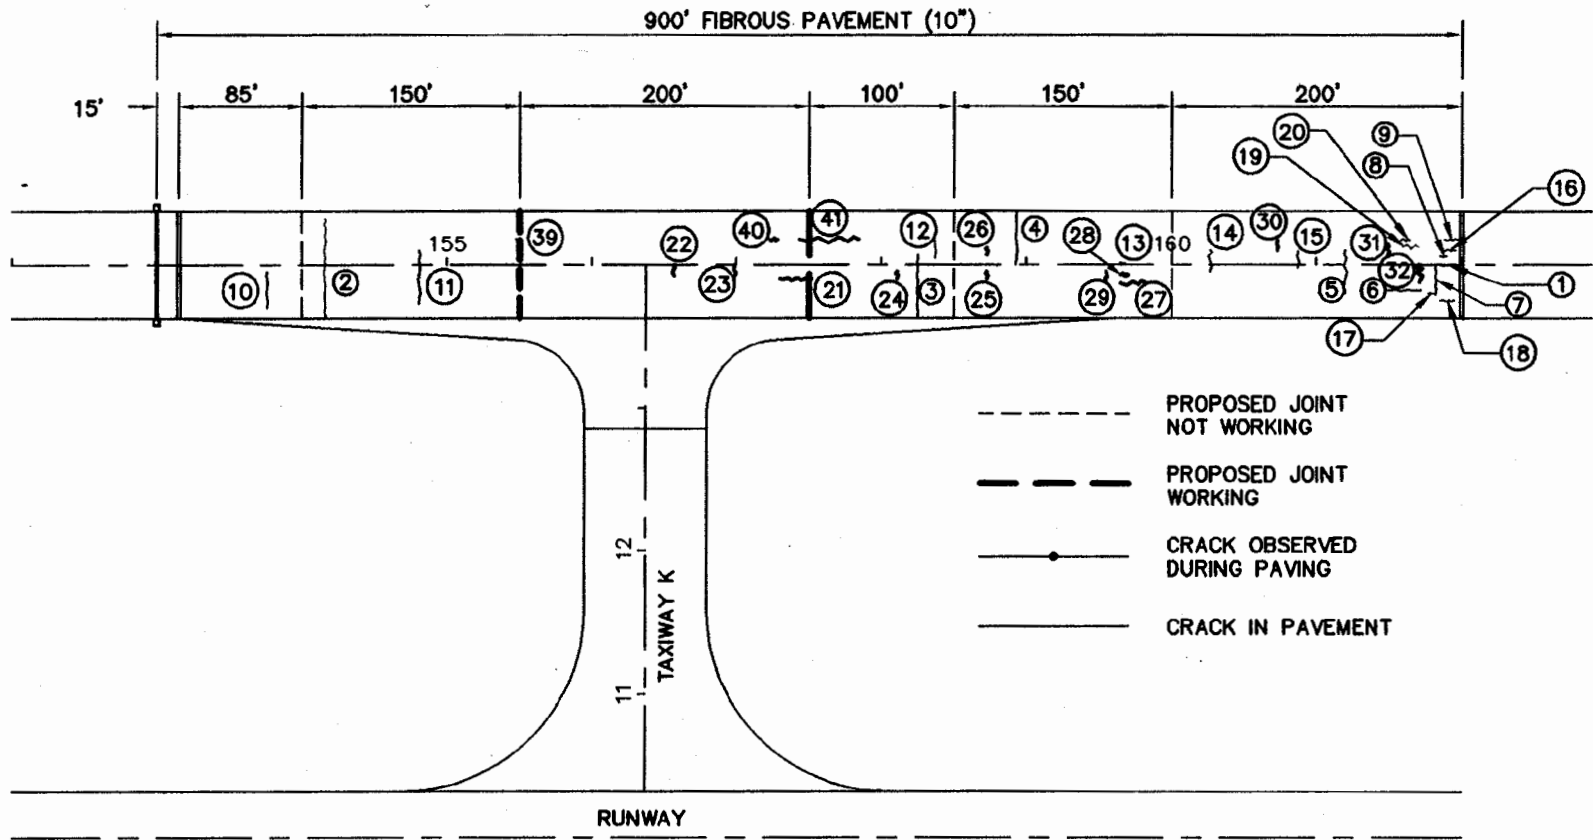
CRACKS IN FIBROUS PCC PAVEMENT, SUMMER 1998
